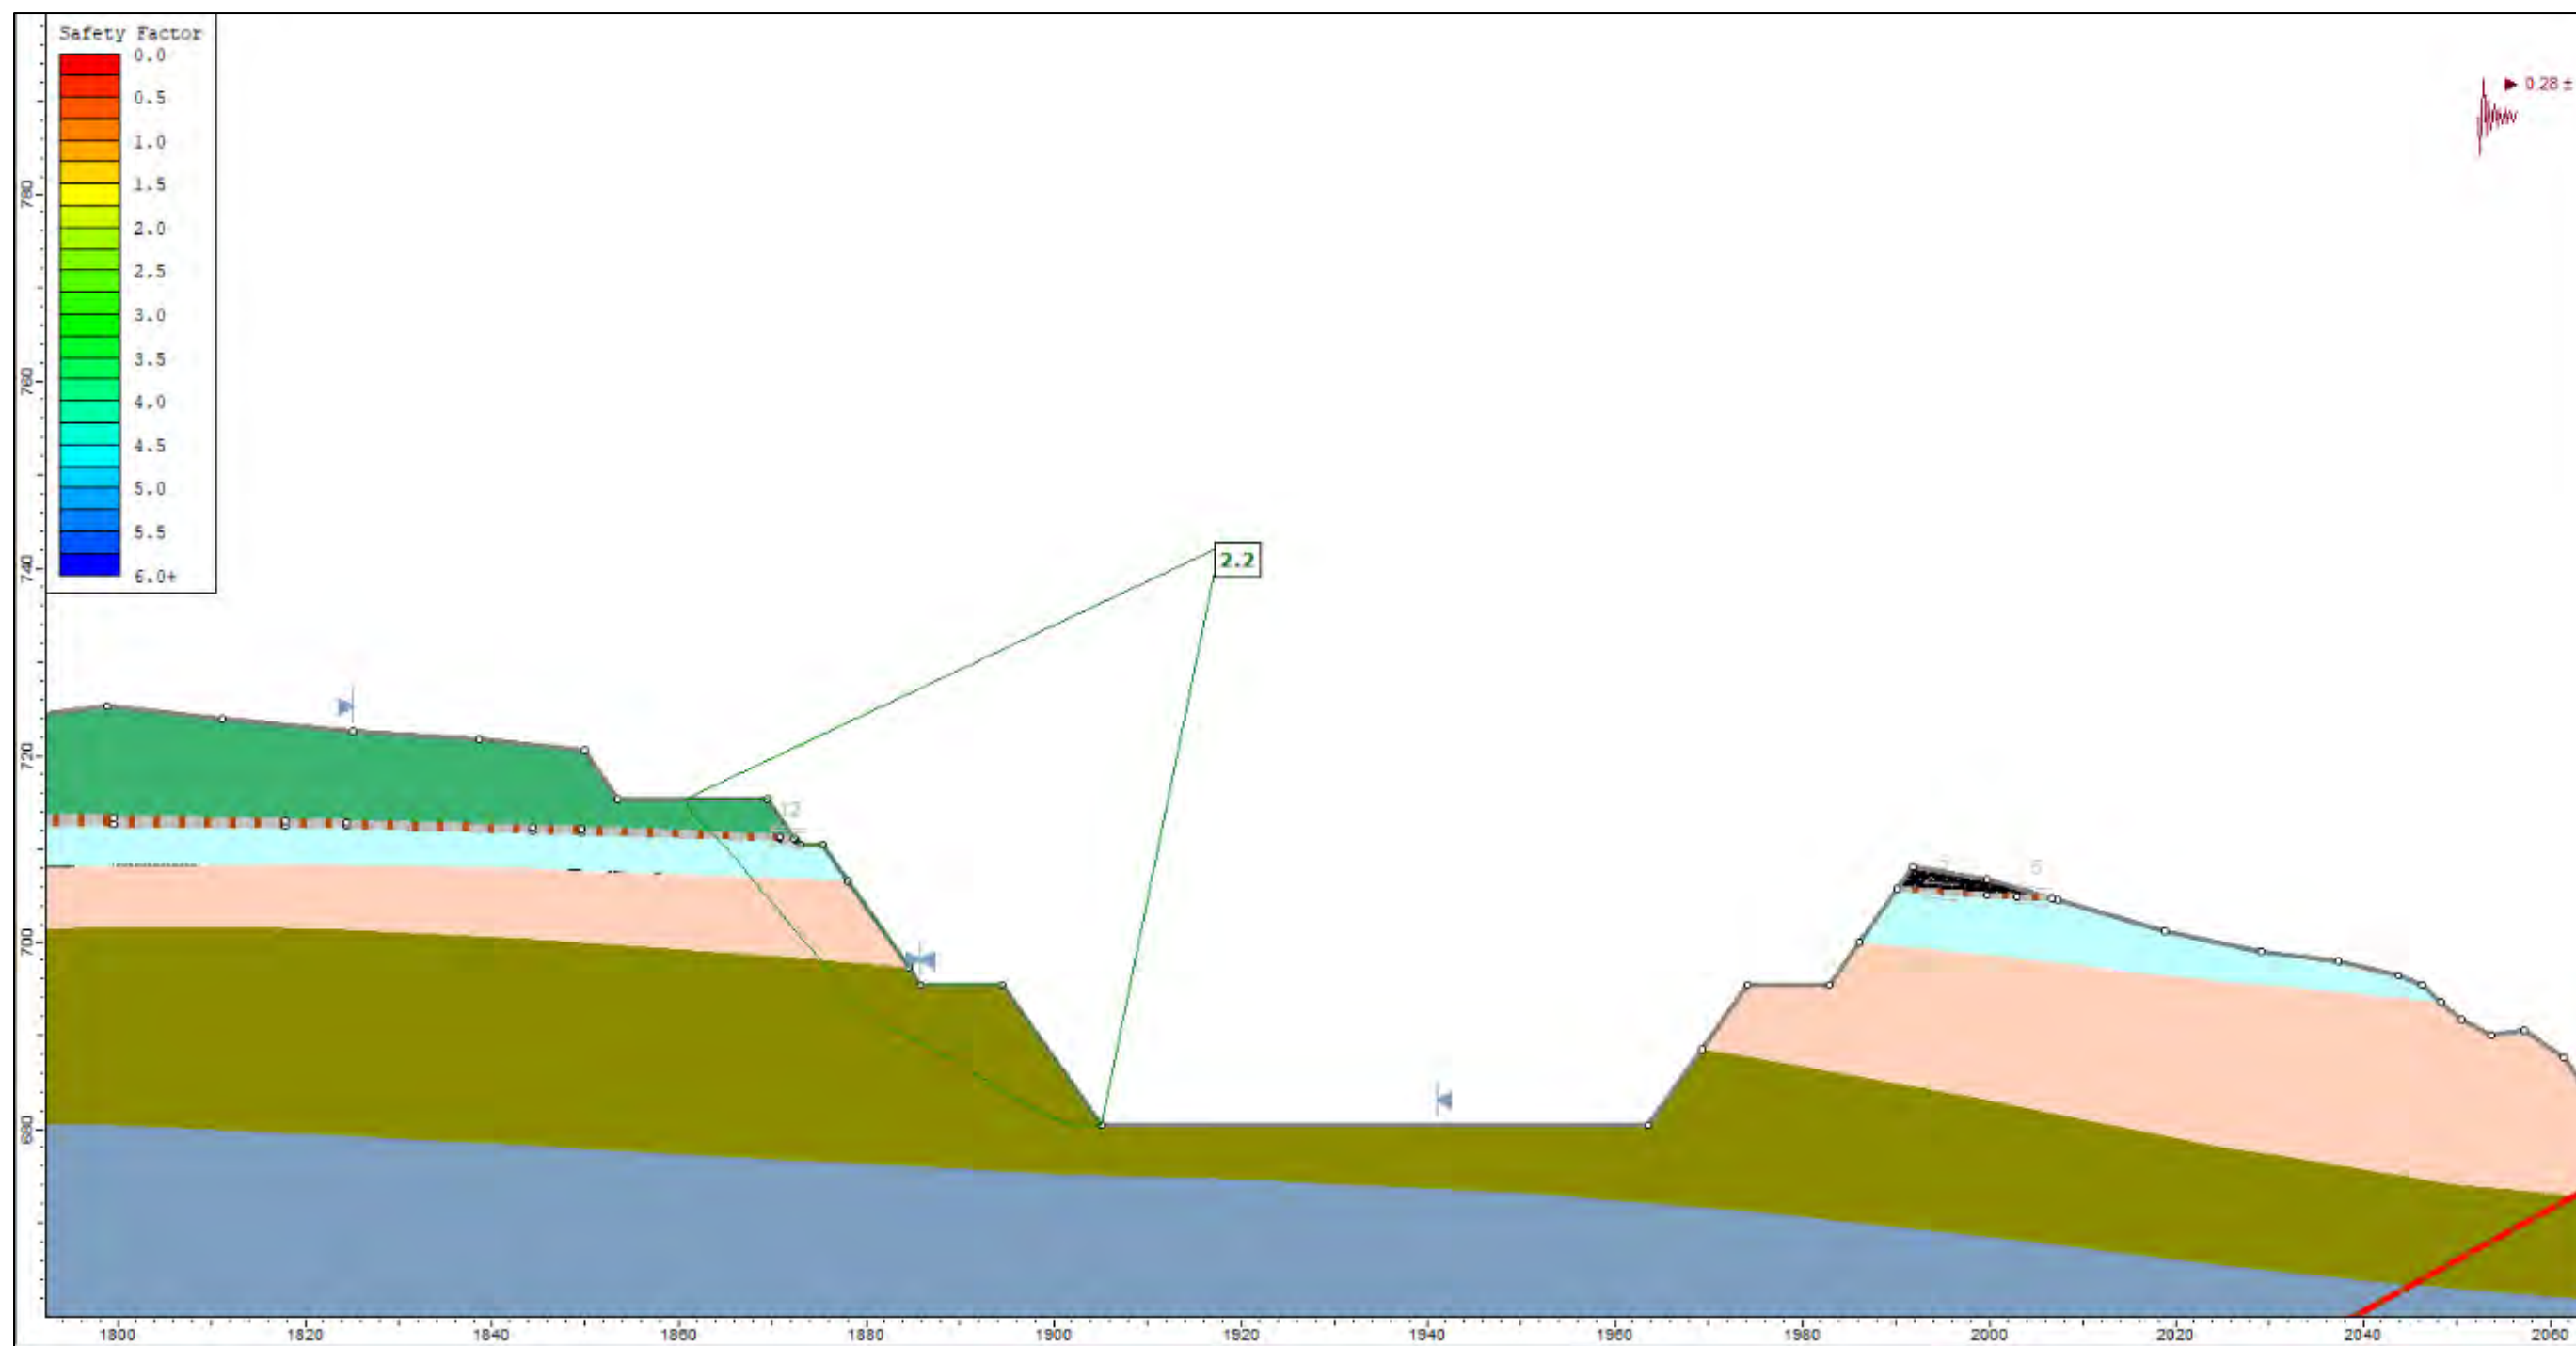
Slope Stability Analysis of West Sump Highwall (North wall) – Section 101 – SLS Conditions.
